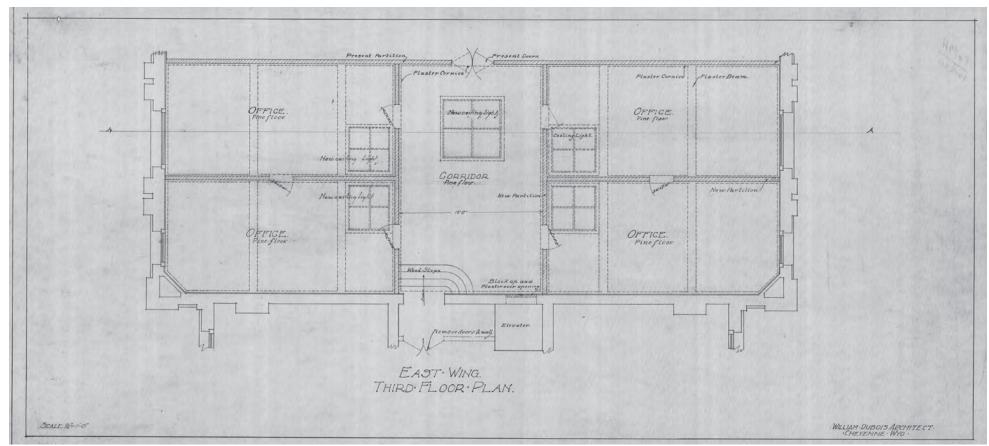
ca. 1916 Plans for Skylights/Laylights at 3rd Floor
